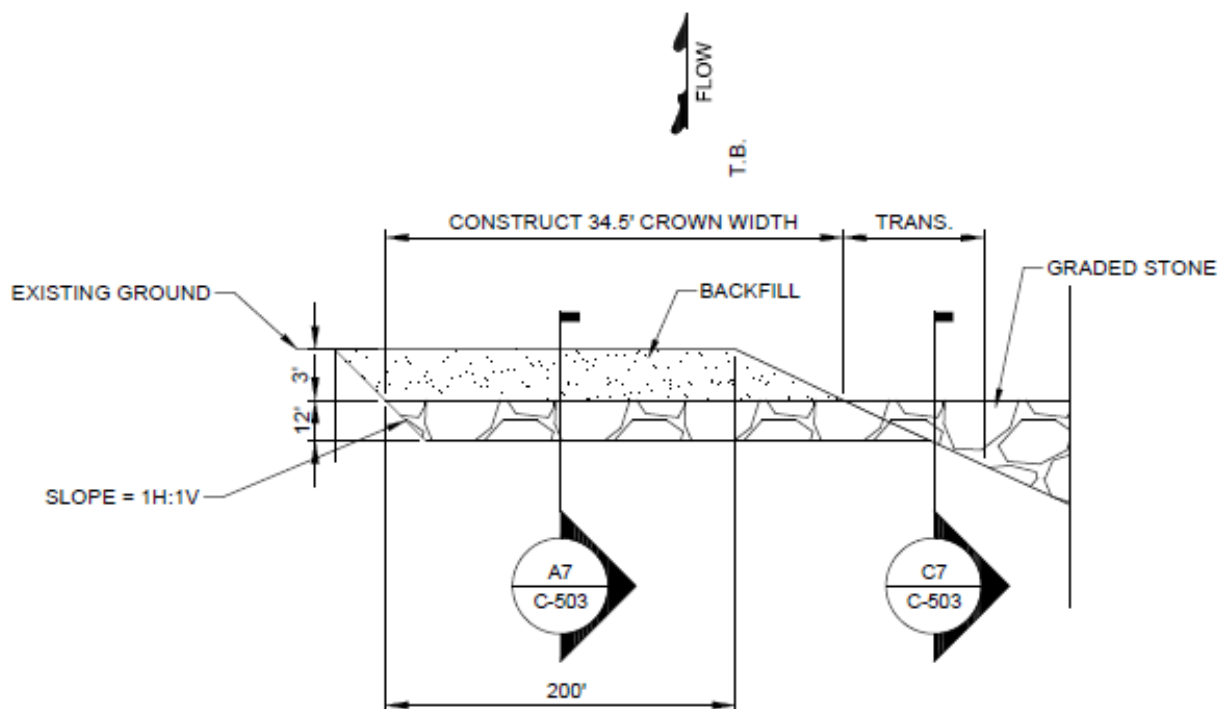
Typical Section for 35.4-Foot Crown Width Dig-In (Looking Upstream)
